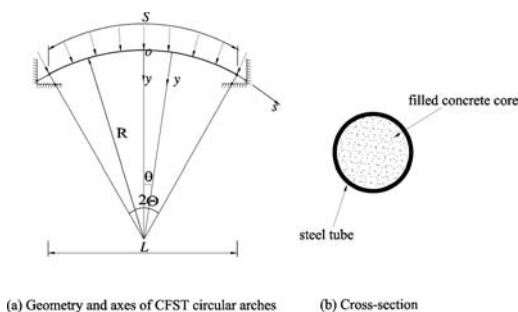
Concrete-filled steel-tubular arch and uniform loading.
